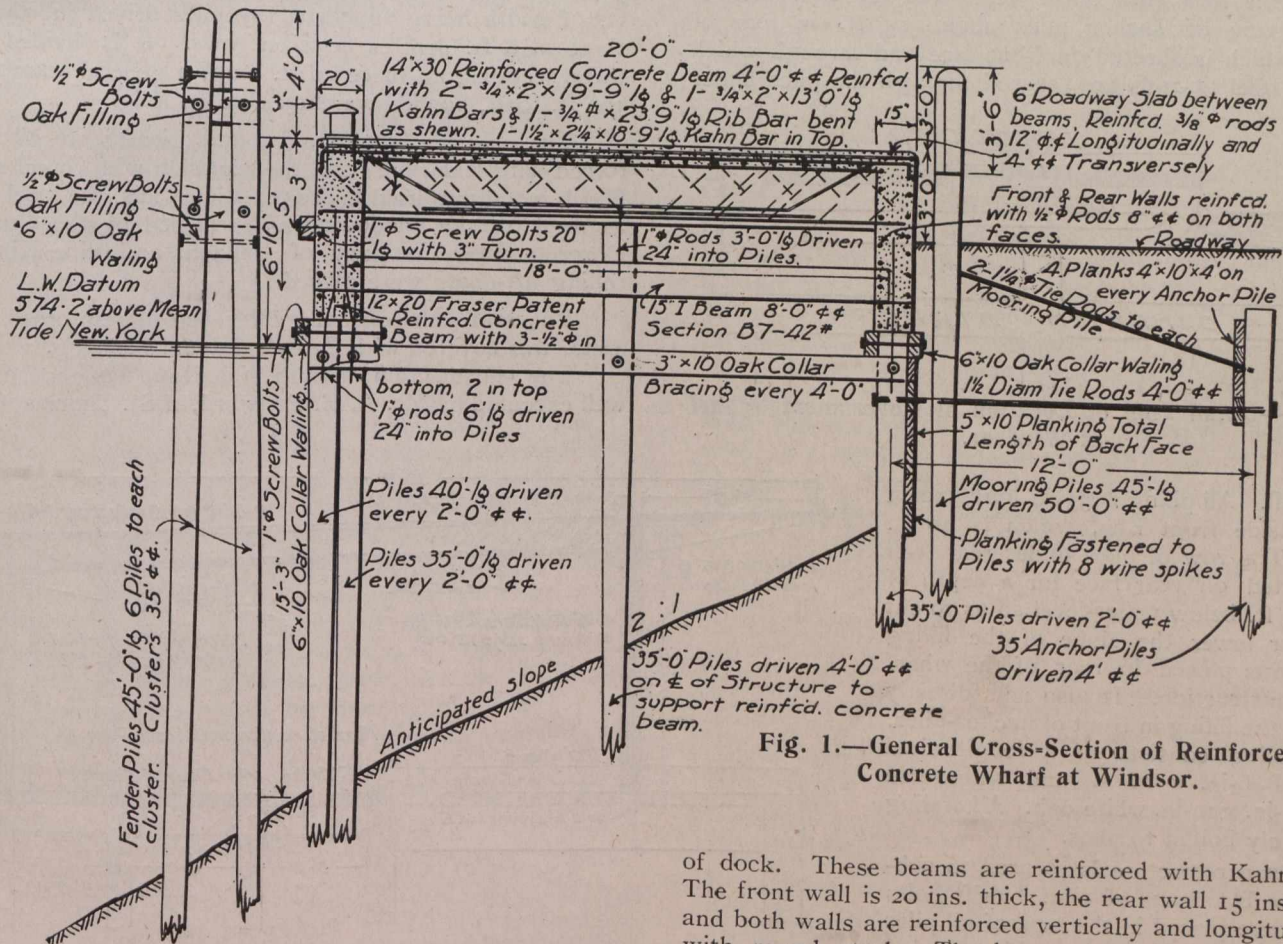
General Cross-Section of Reinforced Concrete Wharf at Windsor.
